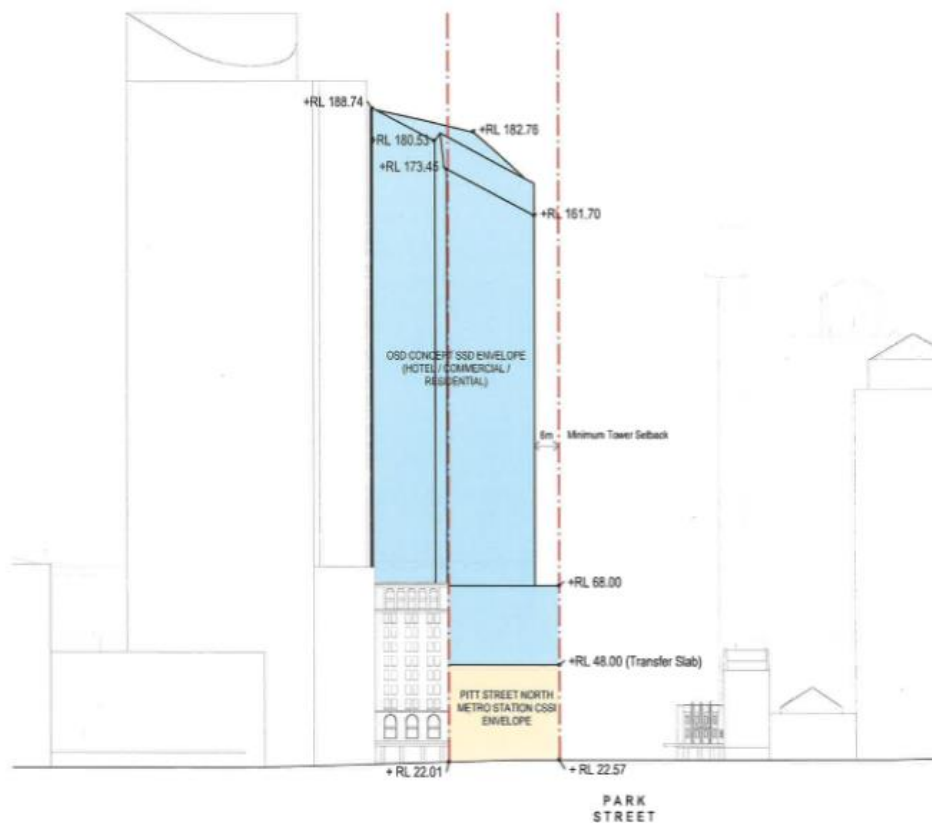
Pitt Street North Concept SSD DA – Envelope – West Elevation (Source: SSD 8875 Concept Stamped Plans)
